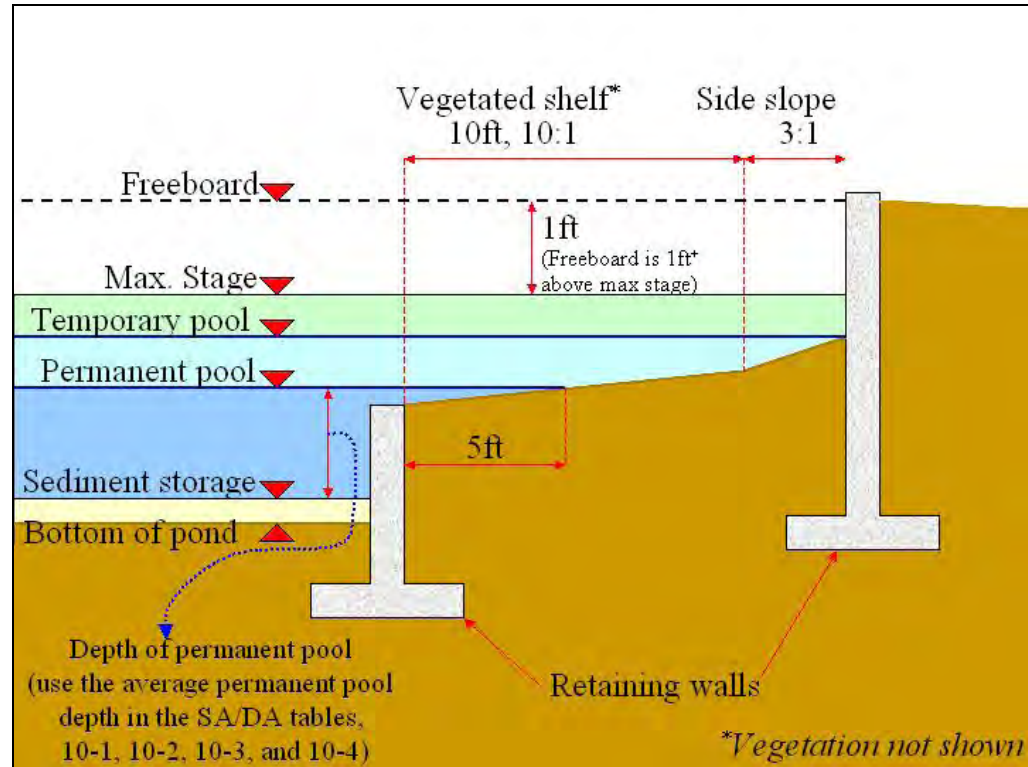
Alternative Wet Pond Design: Retaining Wall Option
